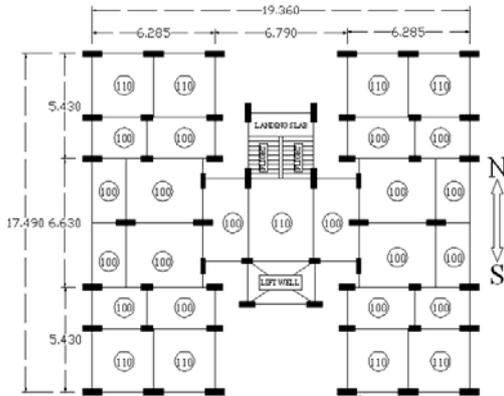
(a) Typical plan of upto 5th floor level, orientation of columns and thickness of floor slabs
